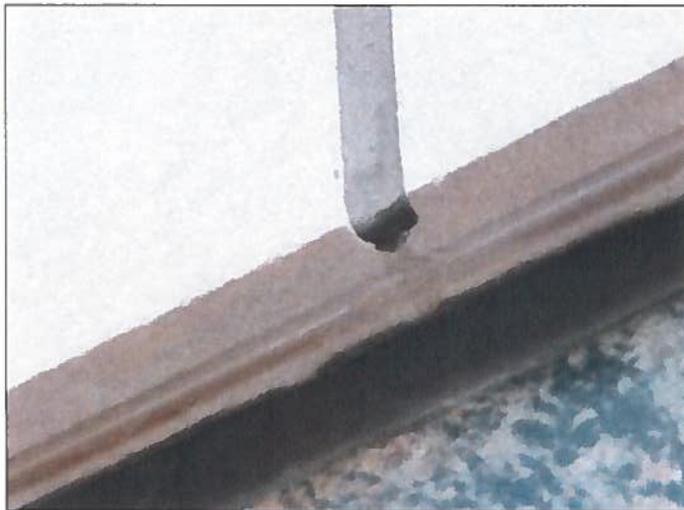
Stone joint with possible mortar behind sealant – Elevation 19
